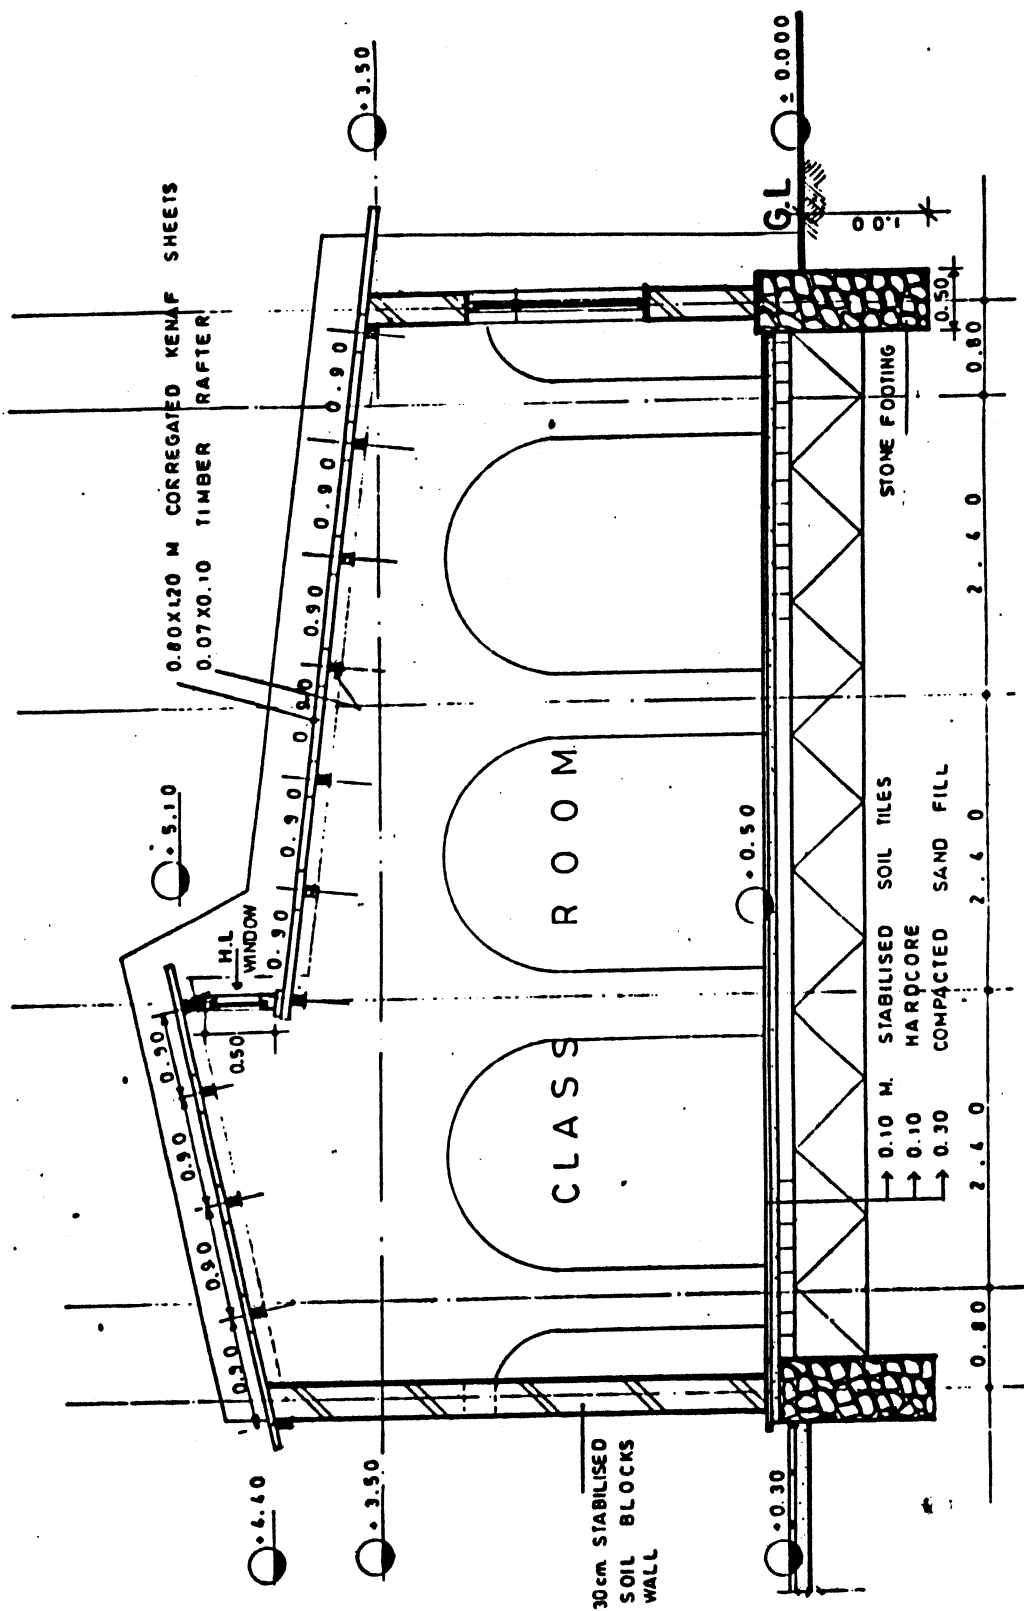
Side elevation indicating step in roof for extra light into the classroom
